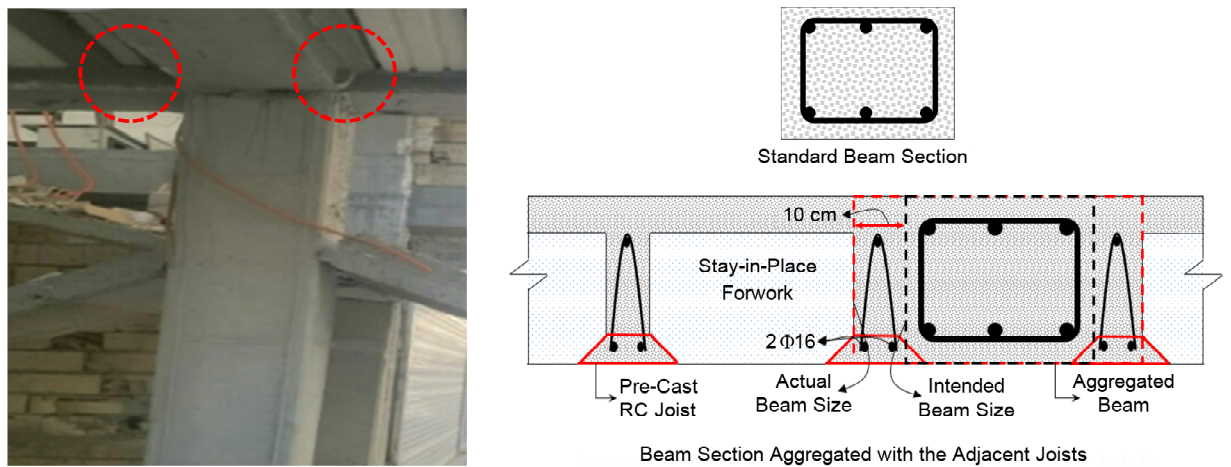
Faulty joining of deck joist to the RC beams and the resulting T-shaped cross section.
